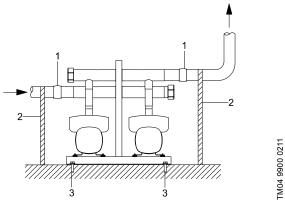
Example showing the position of expansion joints, pipe supports and mounting bolts
